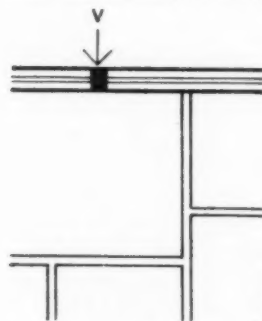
All superstructure walls back-lined 0.30 mm. thick
